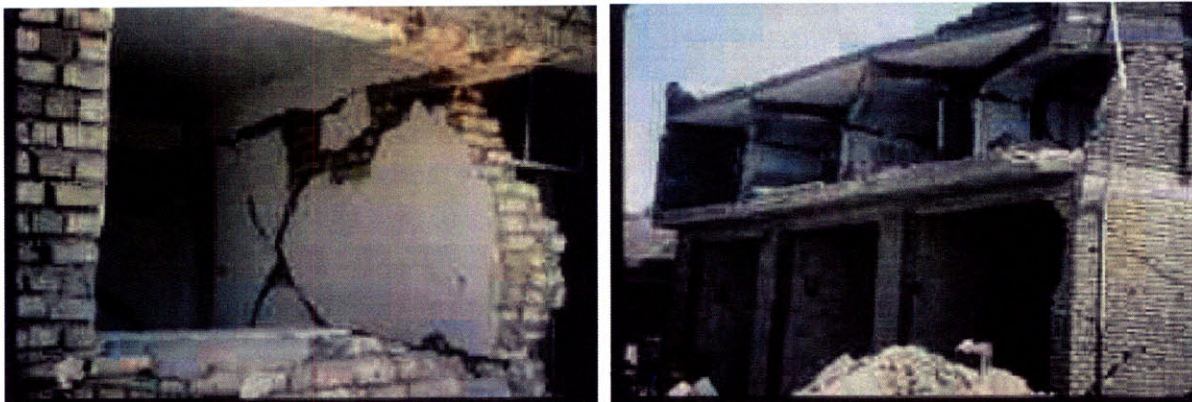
Typical damage to unreinforced masonry walls (NGDC, 2009)
